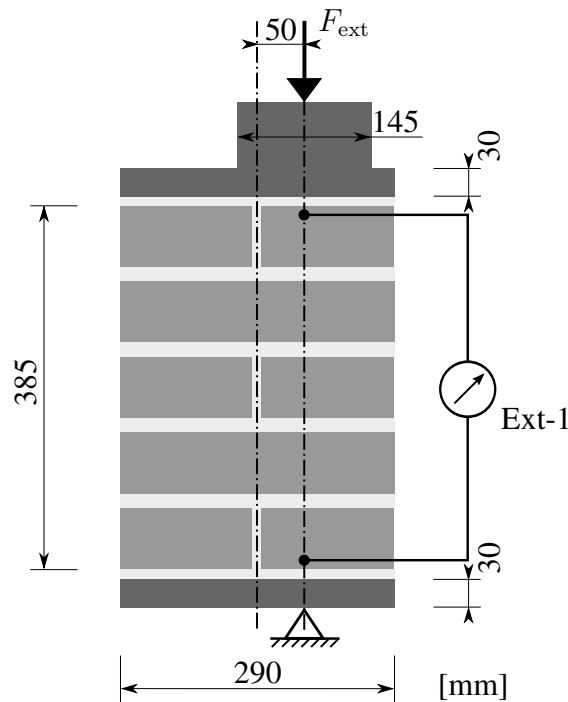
Loading of the tested piers and placement of virtual extensometers.
